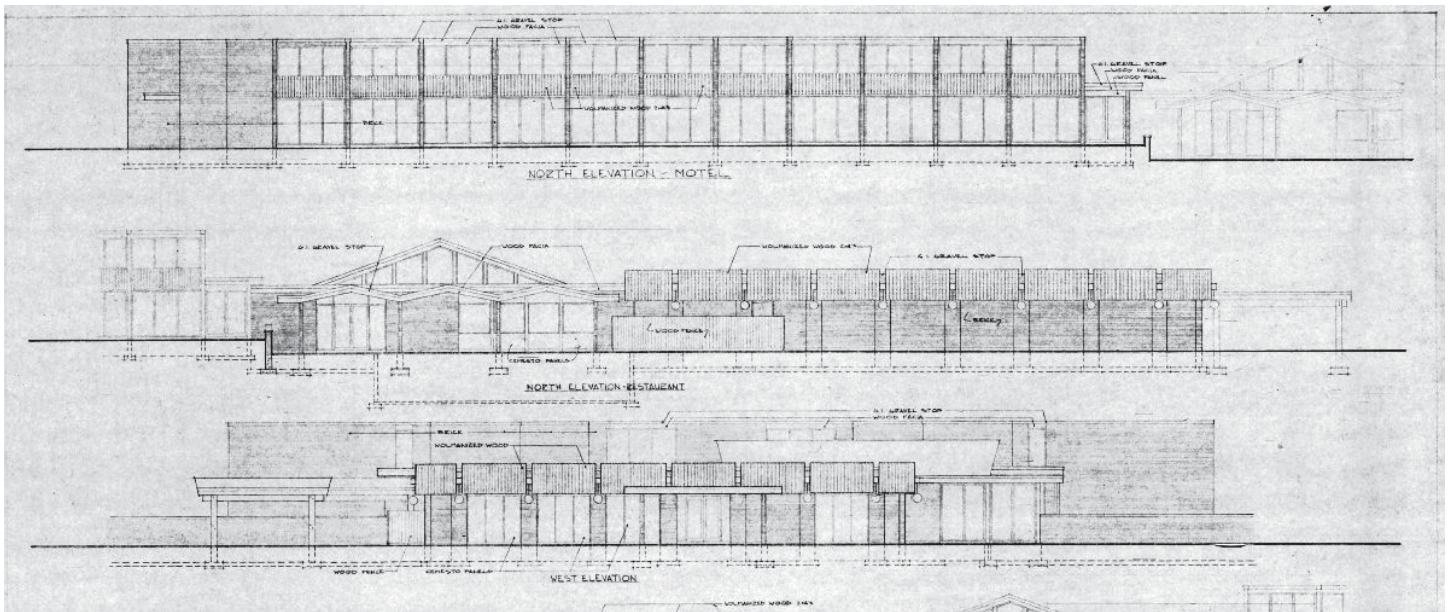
Three elevation views for “Motel and Restaurant” (Hansen, Lind and Meyer, Architects)
